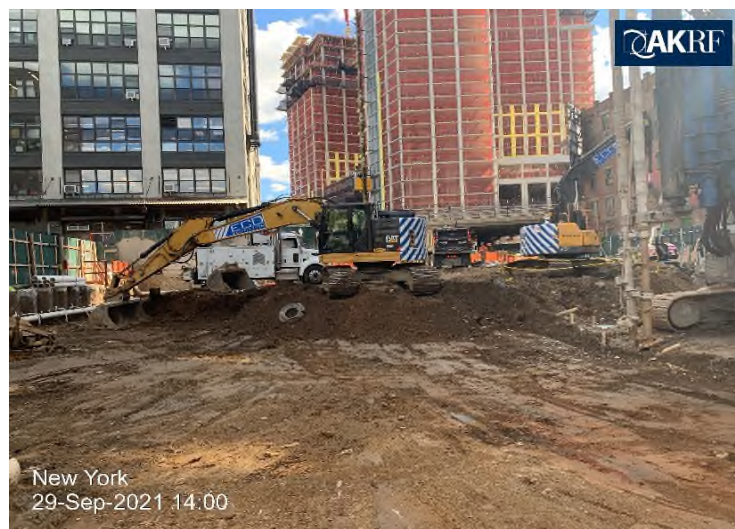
ECD loads a truck with soil/fill in Gri A1, view facing west.
